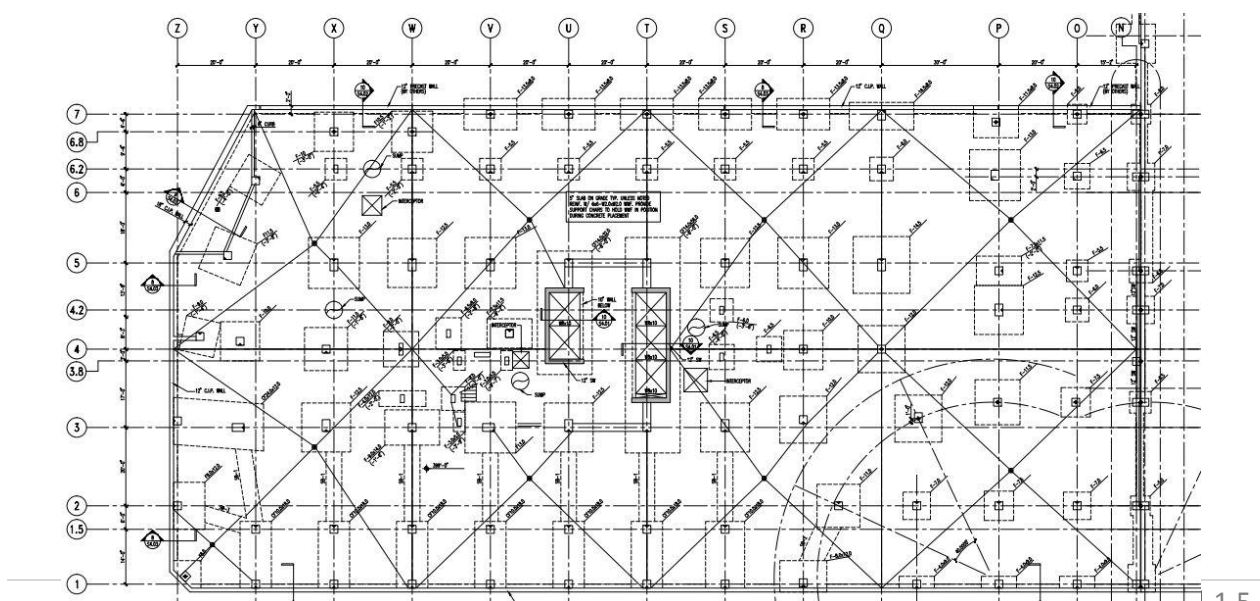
Foundation Plan (refer to Appendix for Enlarged Image)
